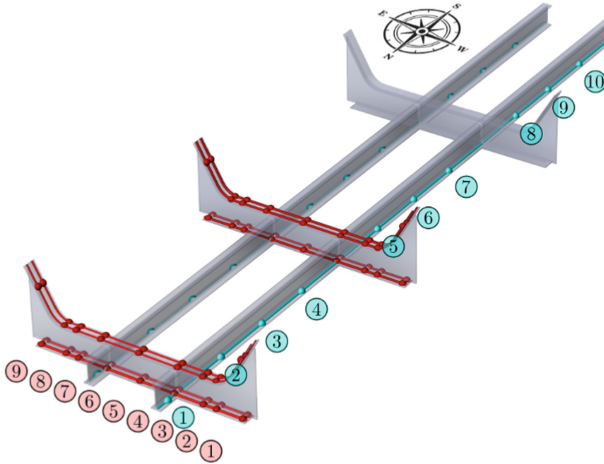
Sensor lines and sensor locations on the transverse girders (red) and longitudinal girders (blue).
